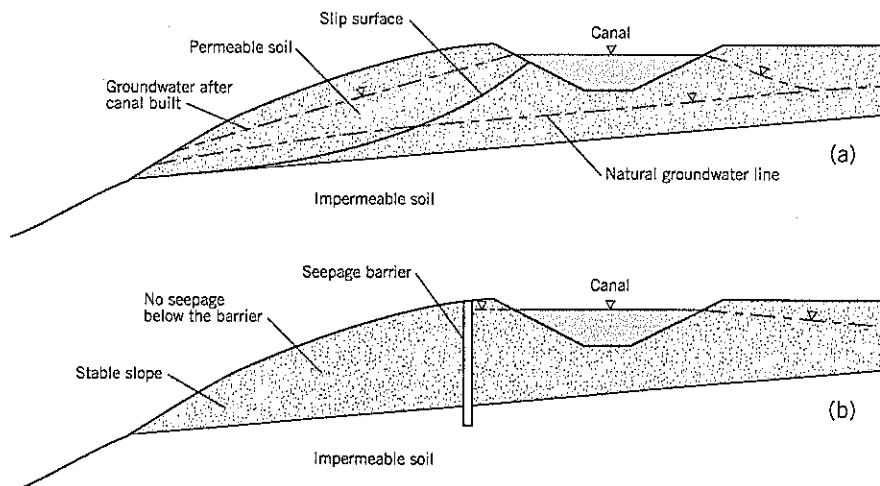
Example of seepage barrier construction to stabilize a landslide:
